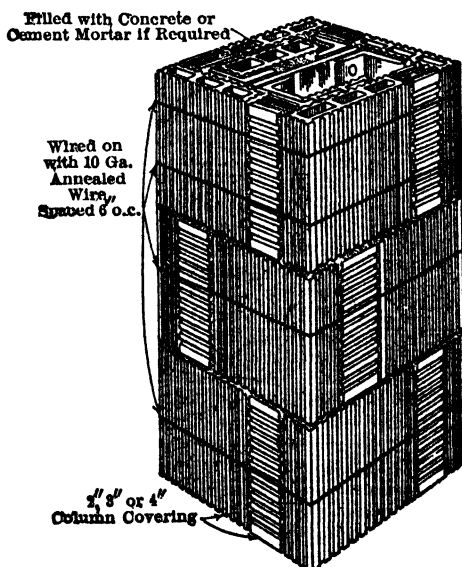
Built-up I Column Protected with Square Column Covering Partition-tile
